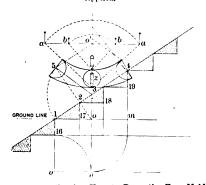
Diagram Showing How to Draw the Face Mold with String and Pins.
